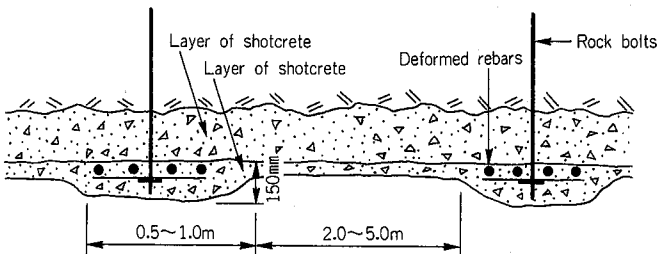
REINFORCED RIBS OF SPRAYED CONCRETE
